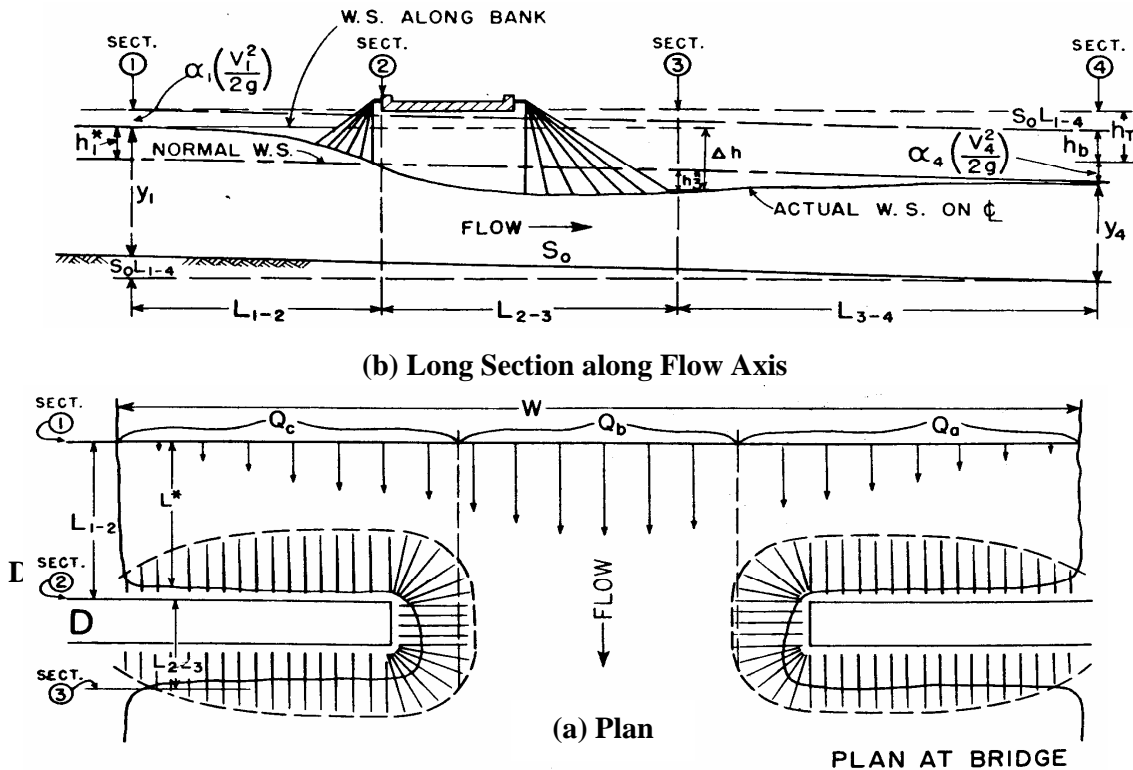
Showing (a) Plan and (b) Section of a Bridge with non-uniform approaching flow.
